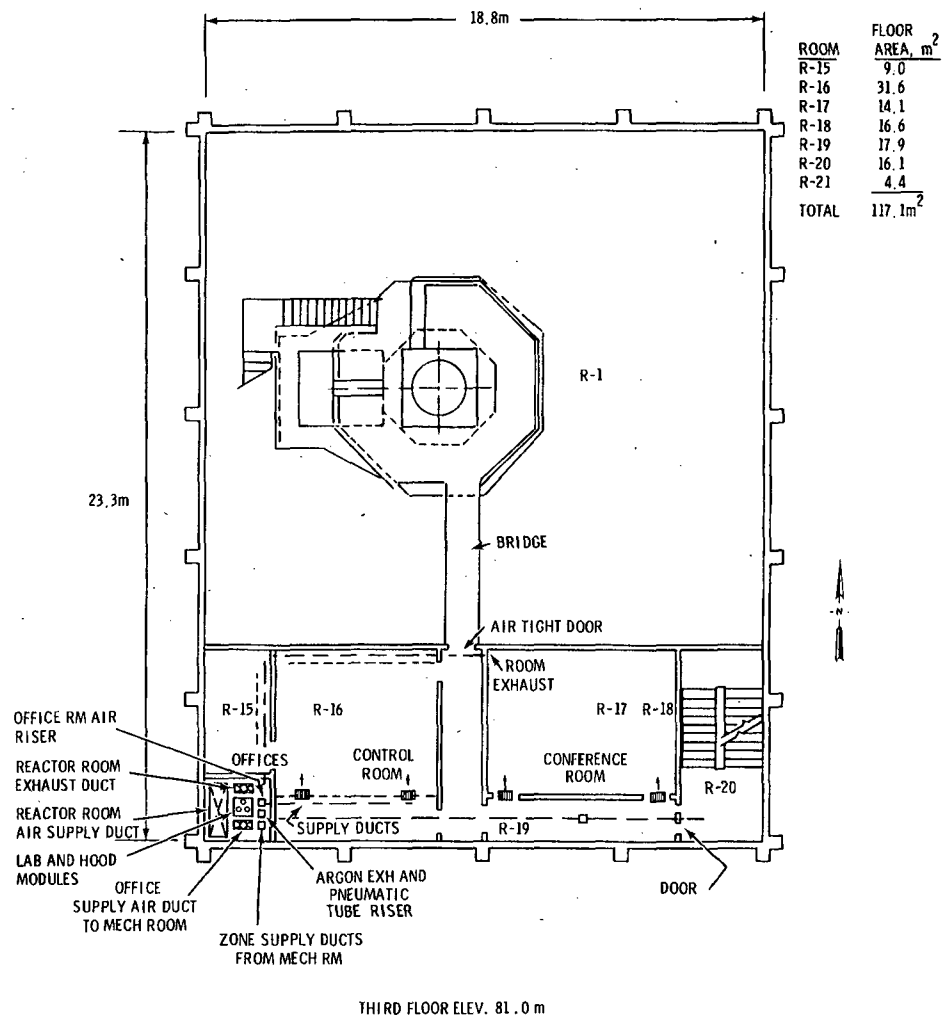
Reactor Building and Annex Floor Plans
